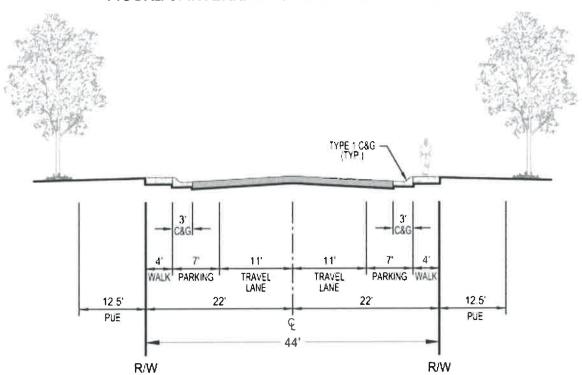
INTERNAL ROADWAY CROSS SECTION
